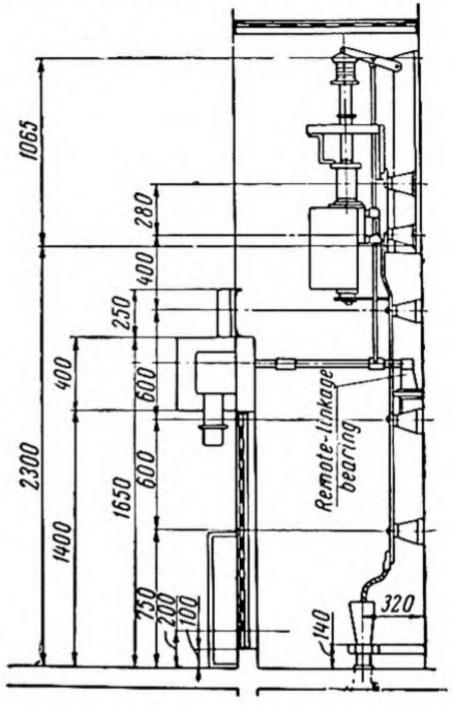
Another method of mounting a BMΓ-133 breaker with a ΠC-10 operating mechanism (intermediate bearing separately mounted)
